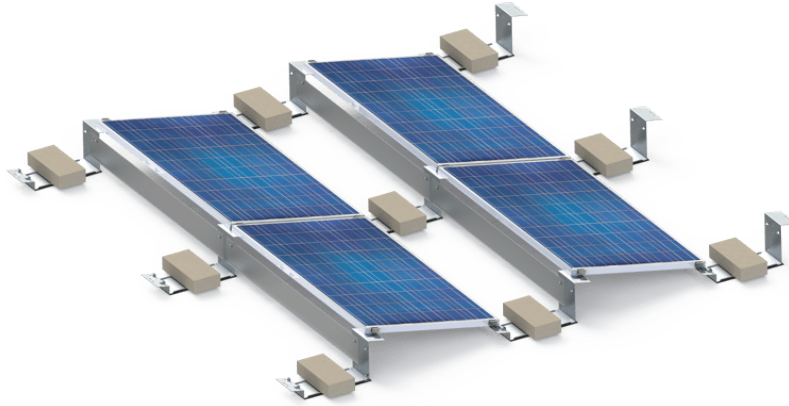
A rendering of the solar PV installation using EkonoRack 2.0 racking method
